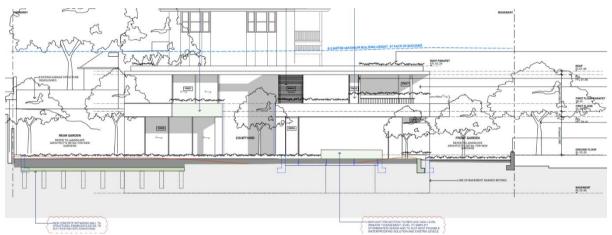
Proposed retaining wall on the western boundary (highlighted in green), Western Elevation - 455.07 Rev B
